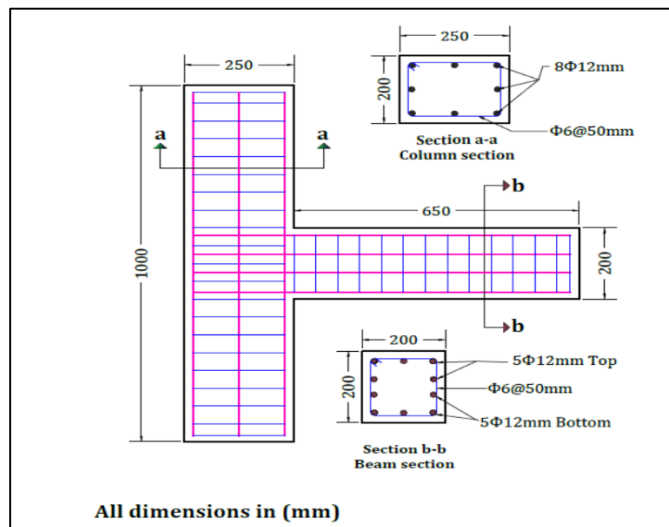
Schematic illustration of the specimen's concrete dimensions and reinforcing bar arrangement.
